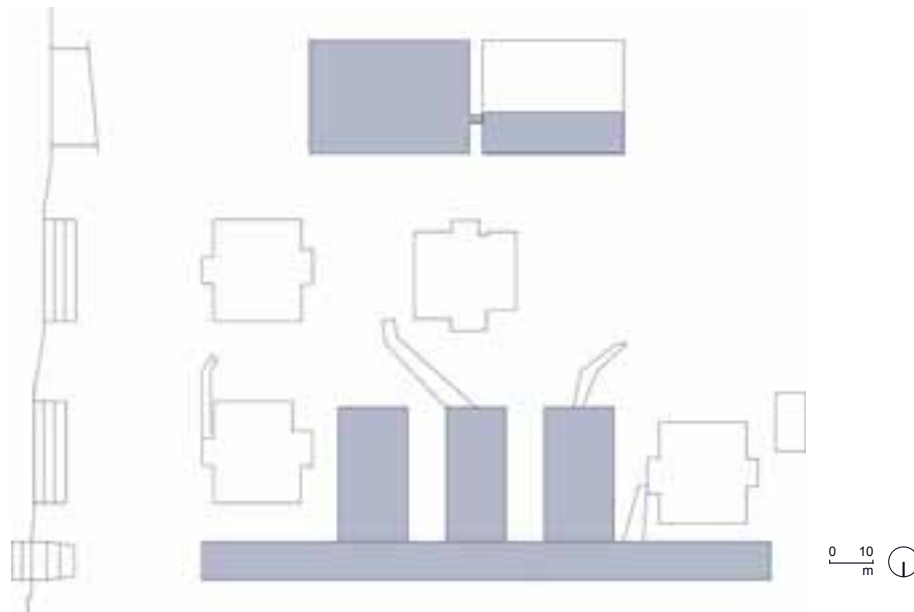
Quinta das Flores School \_ Transversal section of the plot and overall plan
